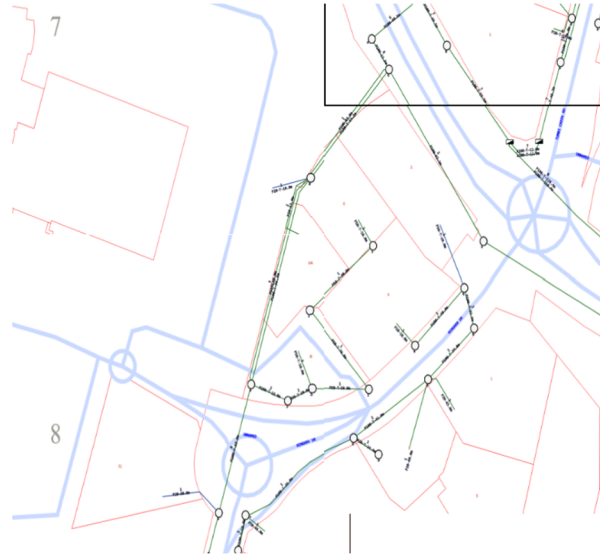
NBN Plan from DYBD (NBN inground services in the public section of Mingara Drive)
